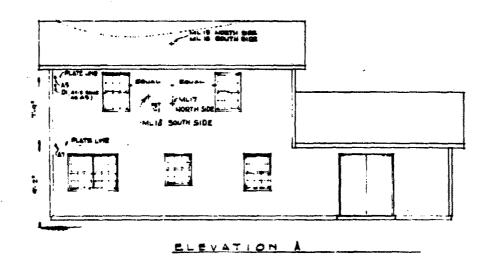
INSTRUMENTATION LOCATION, STRUCTURE E-2 ELEVATION
